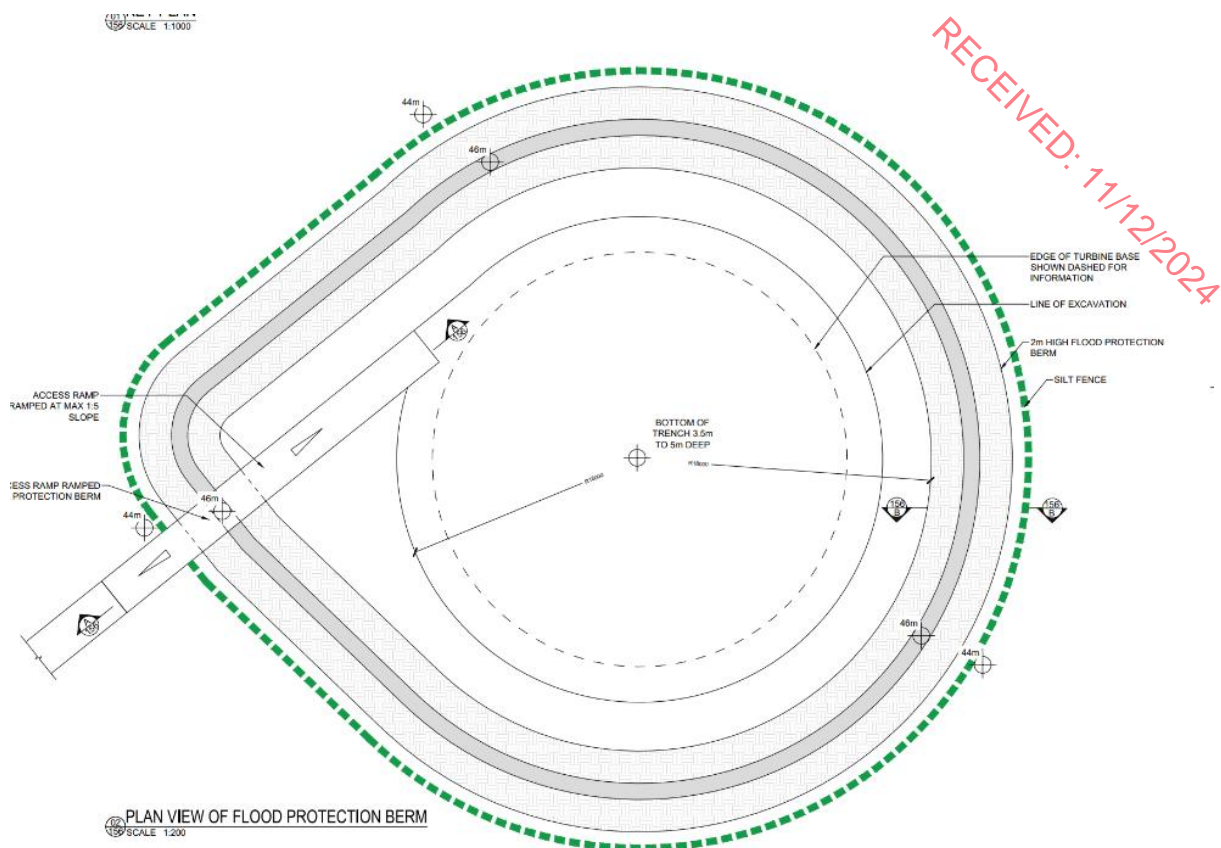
Plan view of Flood Protection Berm (Drawing 22729-156)
